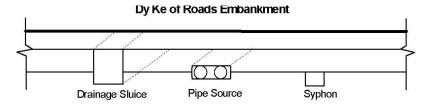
A Schematic View of Drainage Sluice, Pipe Sluice and Siphon on Embankment Which Relieve Drainage Congestion.
